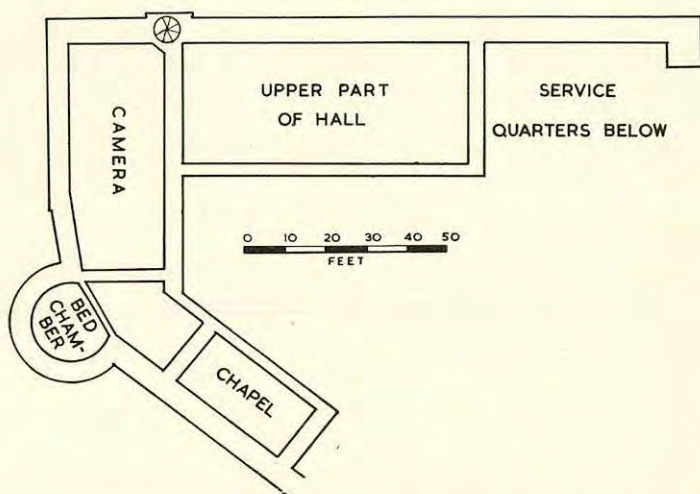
TAUNTON CASTLE. Block plan showing 13th century arrangement of Bishop's Apartments on first floor.
